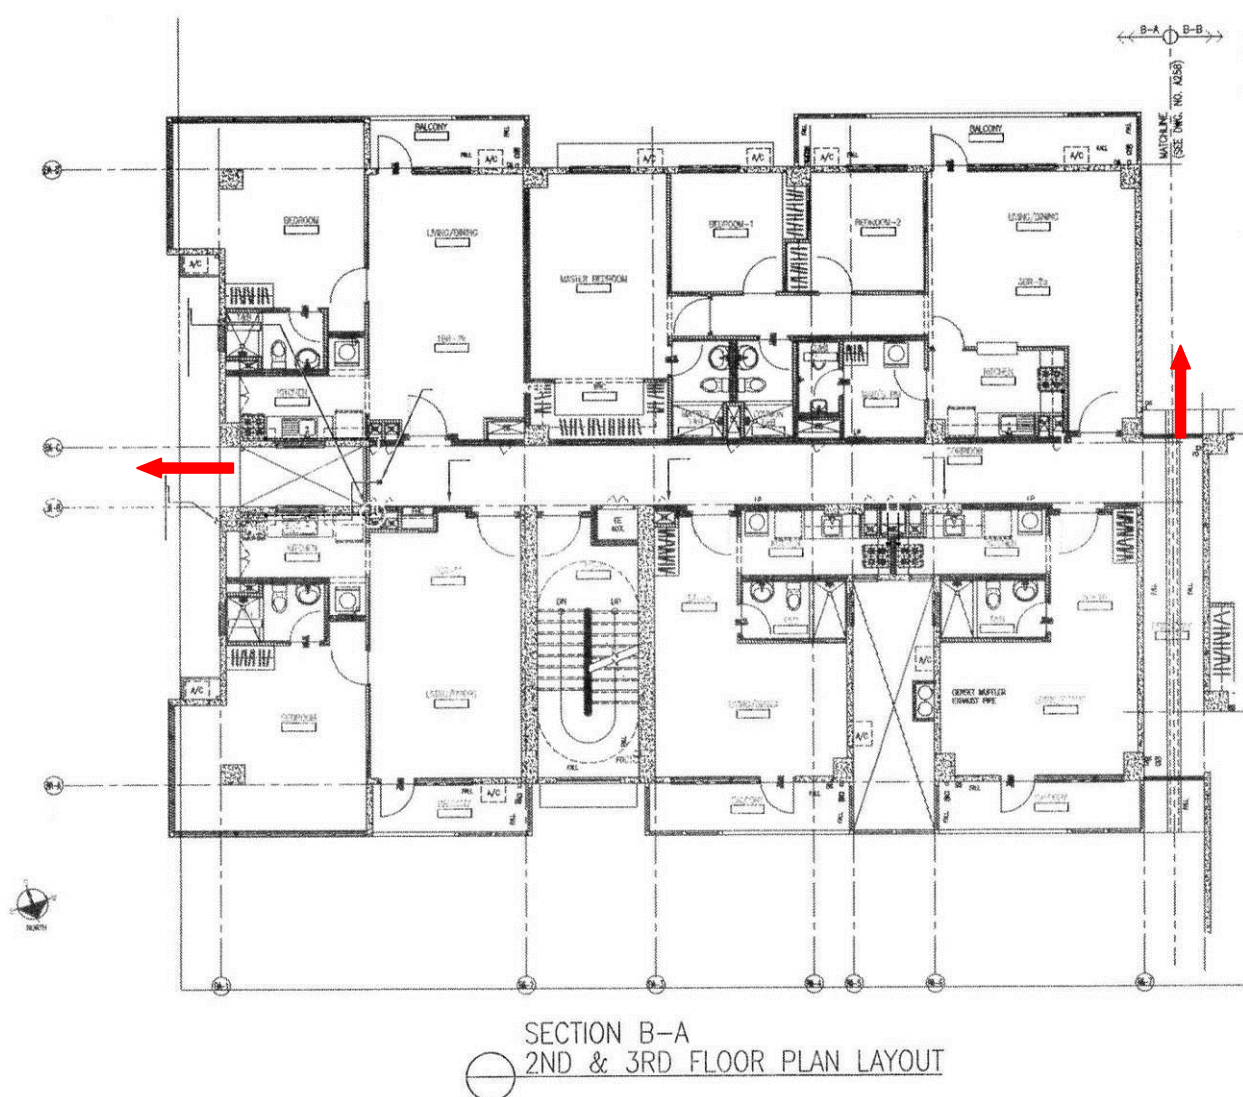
example floor plan showing Tower BA layout above ground floor,
